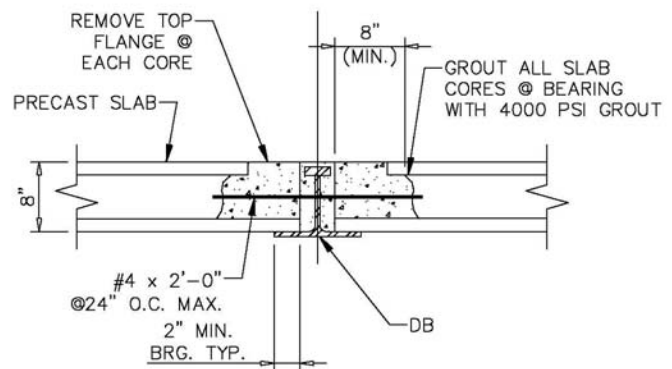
Typical detail of Girder-Slab system at D-Beam section
